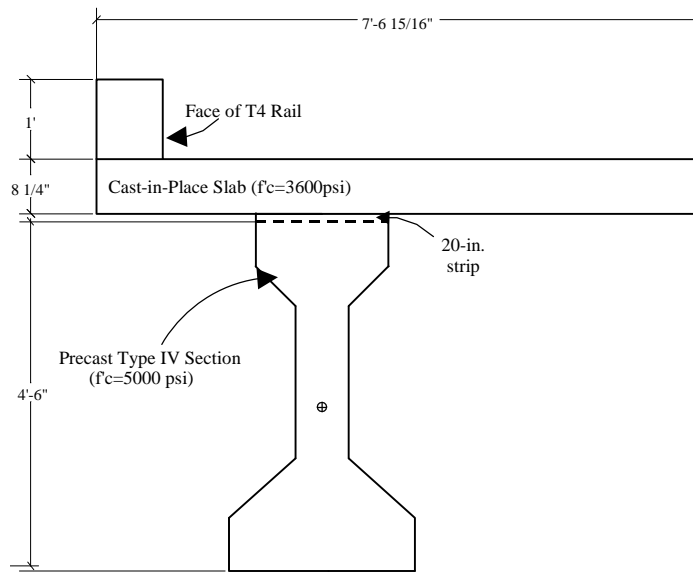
Composite Section for Exterior Girder - Nolanville Bridge
